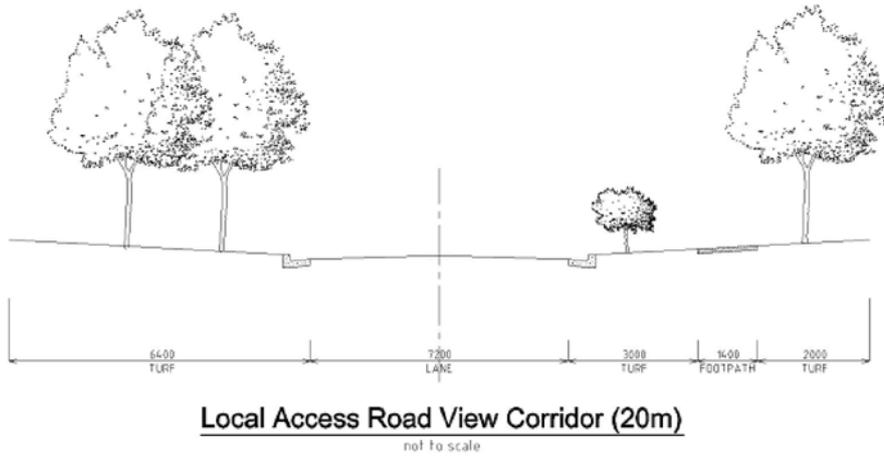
Elderslie Local Access Road View Corridor (20m)
